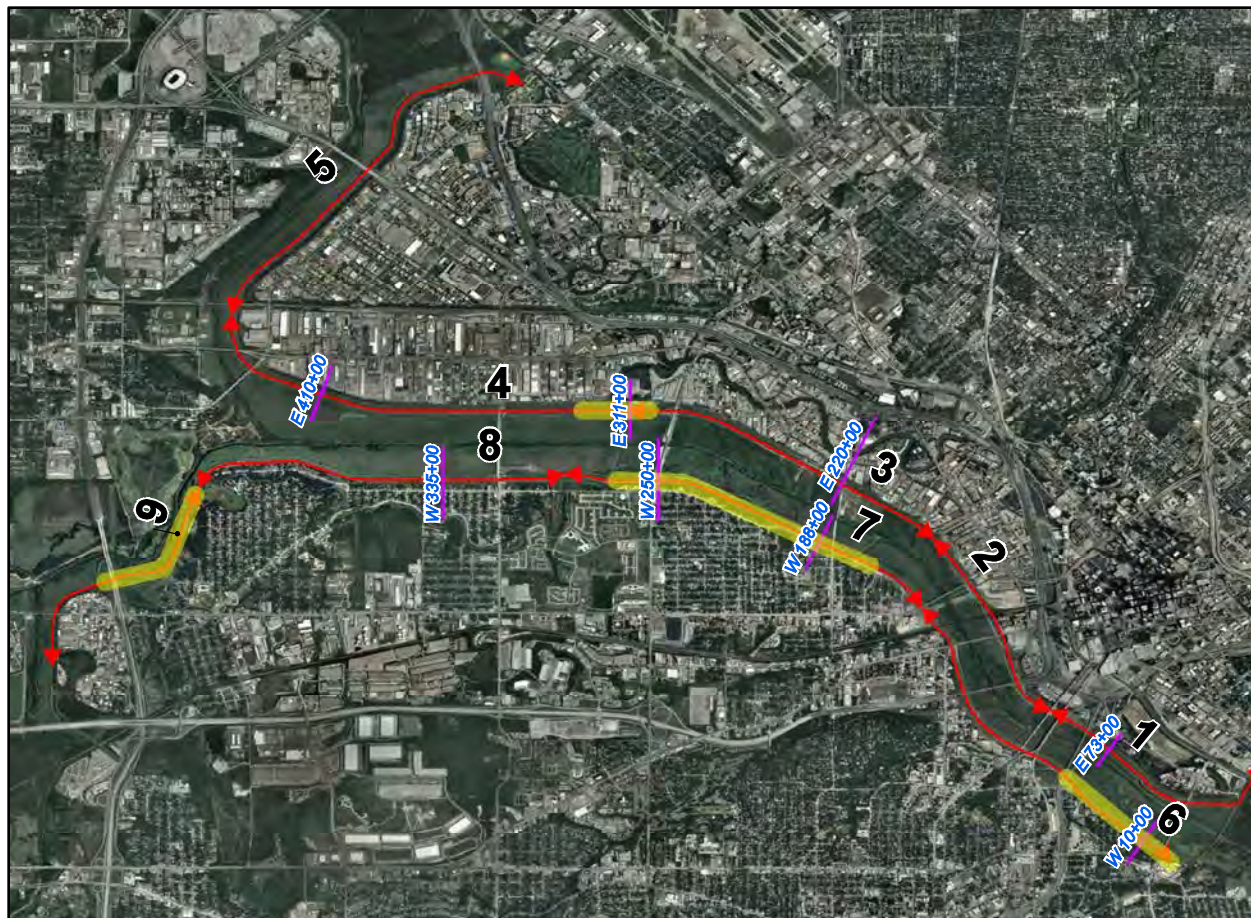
Plan map of the Dallas Floodway with near surface sands indicated in yellow.
